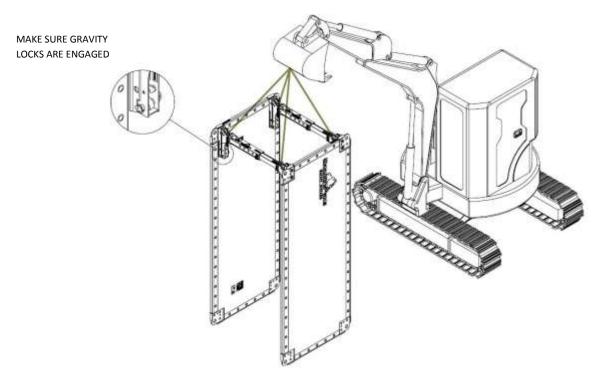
Assembly Step Eight – Securement of the Panels to Top Struts
